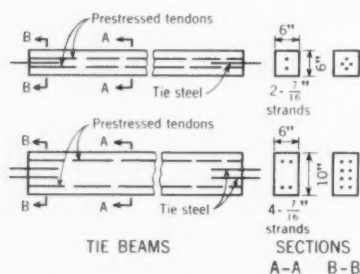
Tie-beams connecting wall and anchorage are precast prestressed members.
